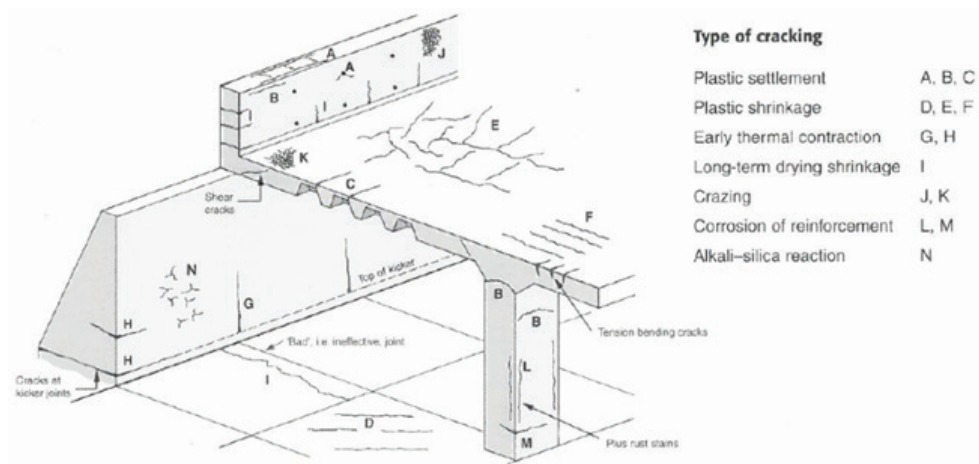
Example of cracks and crack patterns in a hypothetical concrete structure [9].
